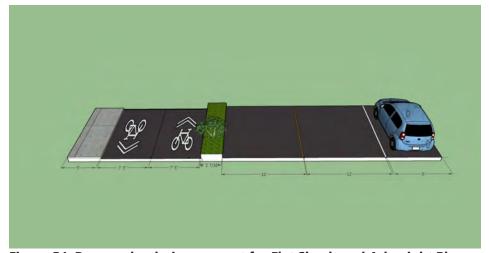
Proposed redesign concept for Flat Shoals and Arkwright Place, from Stovall Street in Reynoldstown to Hosea Williams in Kirkwood
